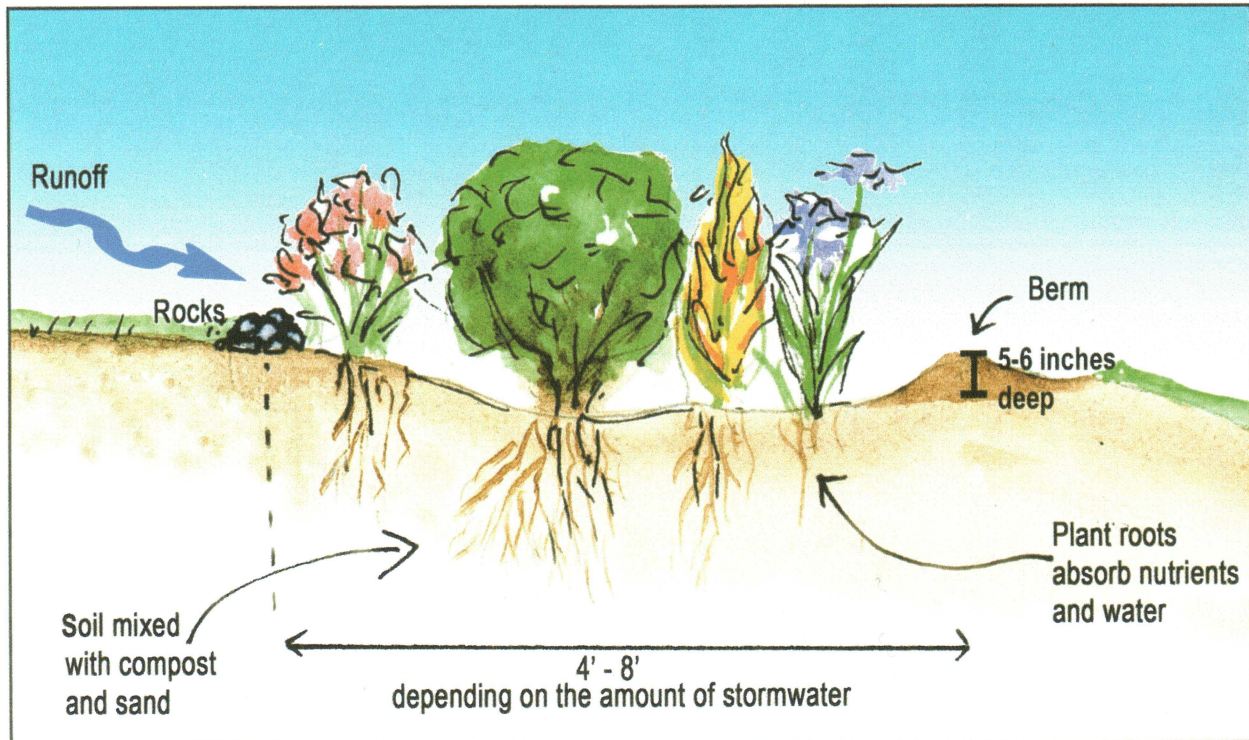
A sketch of your rain garden can help guide the construction process. In the example above, the rain garden is about 4-8 feet wide and has a surface ponding depth of 5-6 inches. Rocks located at the entrance point
